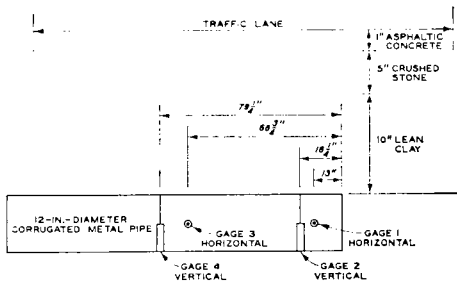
Cross-section of traffic lane, showing location of gages and test pipe.
